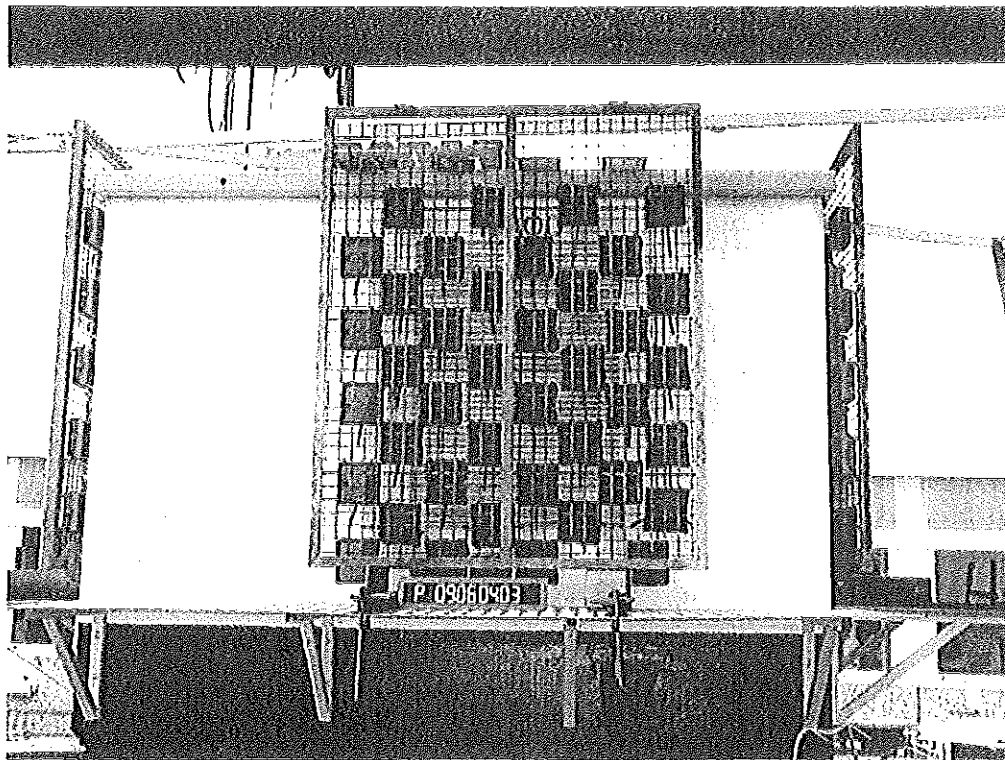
Right side view of the test object with indicators after test no. 090604-03
